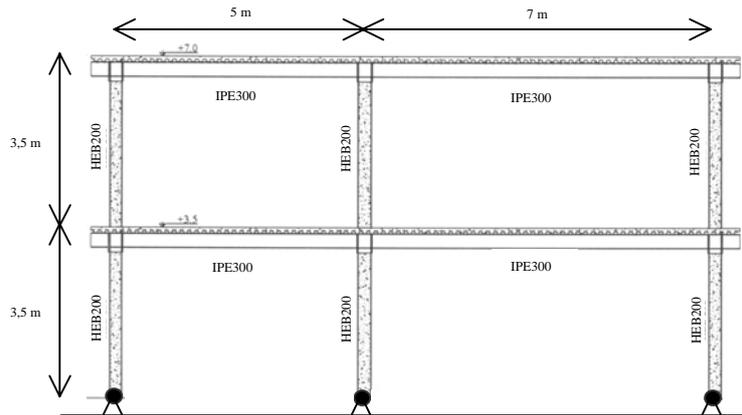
isolated 2-D composite frame of the “Ispra” building
